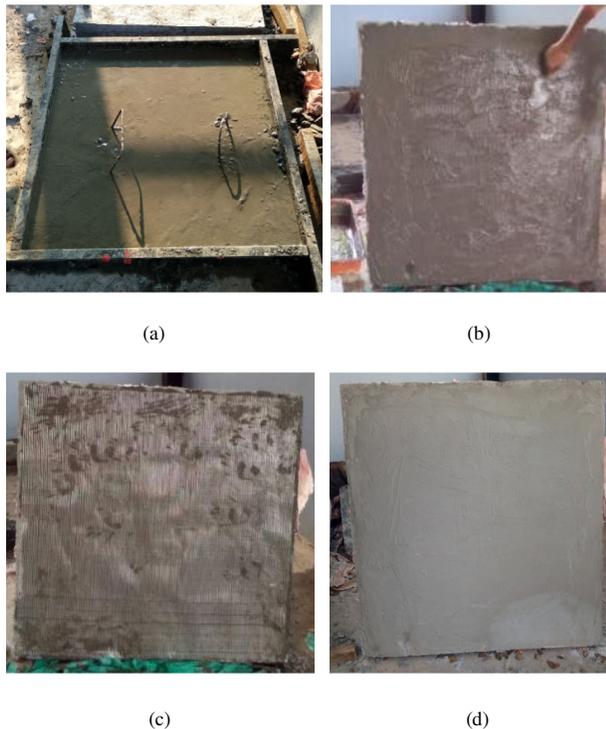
TRM strengthening application steps of specimen C1: (a) Specimen C1 casted (b) first mortar layer application (c) nylon textile application (d) final finished surface
